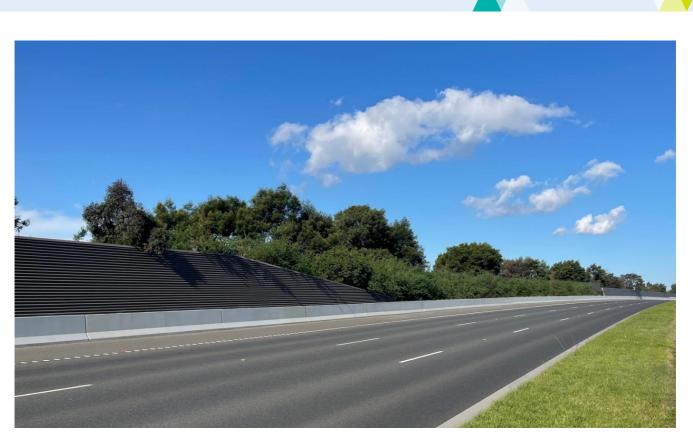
Alignment to create landscape planting pockets to break up the visual mass of the wall, Dingley Bypass (Clarinda, Victoria)
